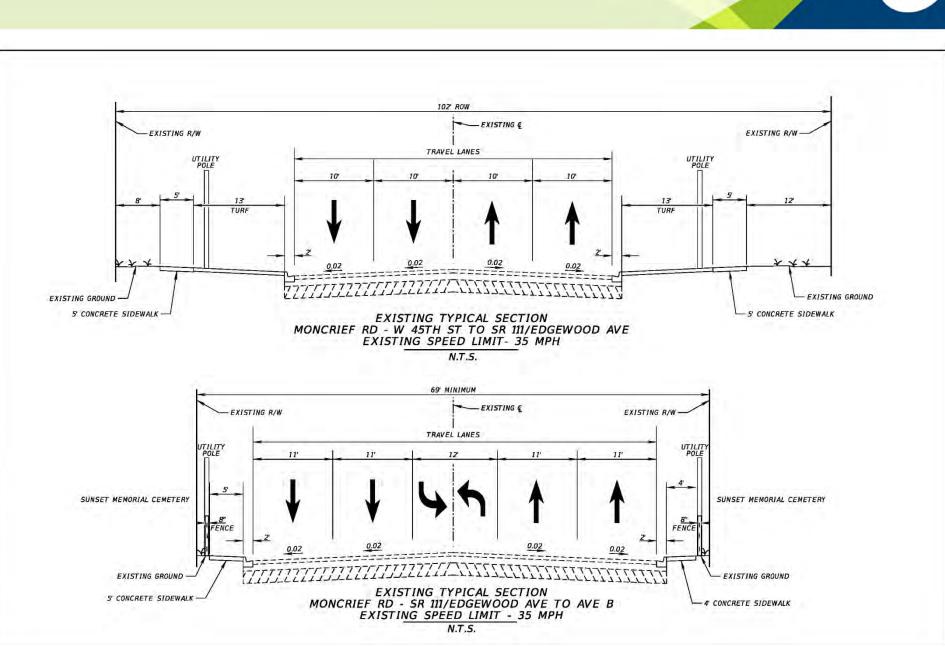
Moncrief Road Typical Sections (45<sup>th</sup> Street to Avenue B)
